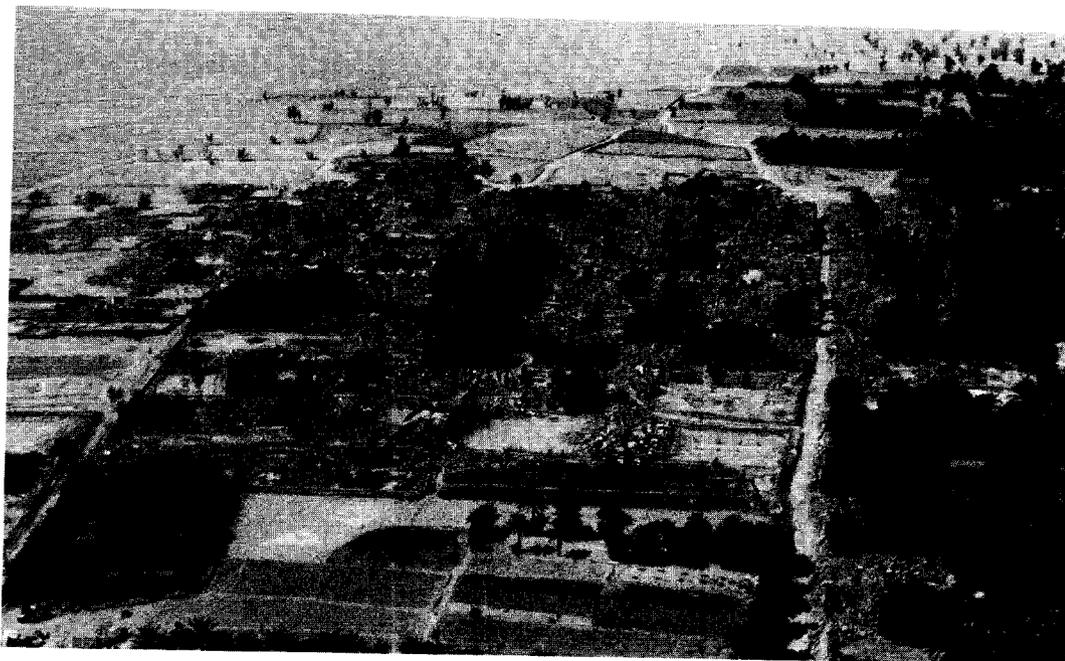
Aerial view of Fahalanj village (No. 47 in Fig. 1 and Table 1) with complete destruction of adobe houses. Note a few dome vault houses which stood up during the earthquake.
